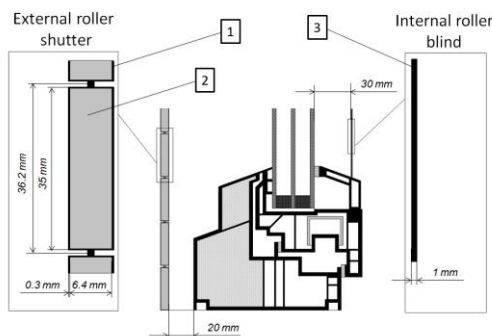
External roller shutter and internal roller blind geometry sketch. Numbers indicate the flowing parts: 1 - external roller shutter material, 2 - external roller shutter fill and 3 - internal roller blind material.
